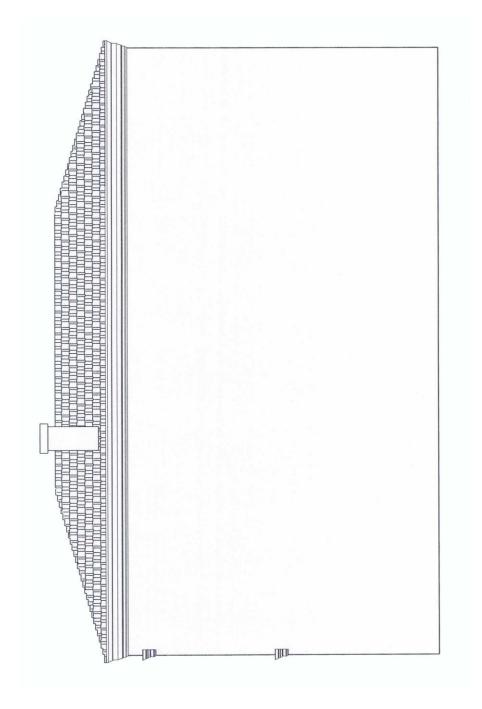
Rear Elevation of 39-Türkkuyusu Street Scale: 1/75
